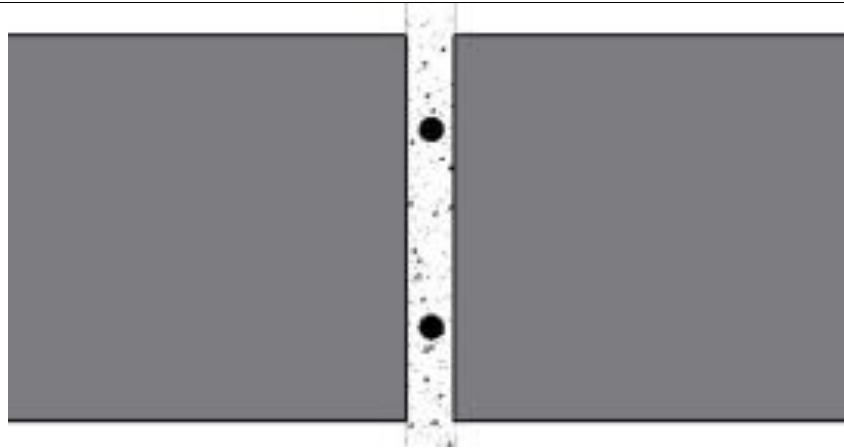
One foot section of the wall modeled as a column. The vertical rebar is taken to be the rebar located at the center of the column. Half of a brick is taken on each side and modeled as concrete.
